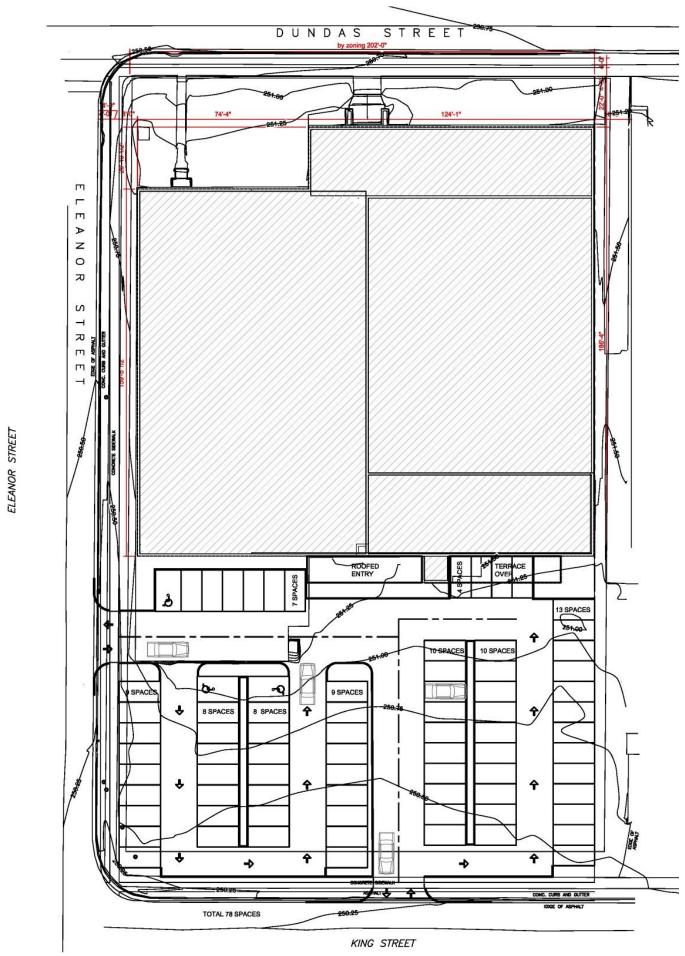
1153-1155 Dundas Street – Initial Conceptual Site Plan
